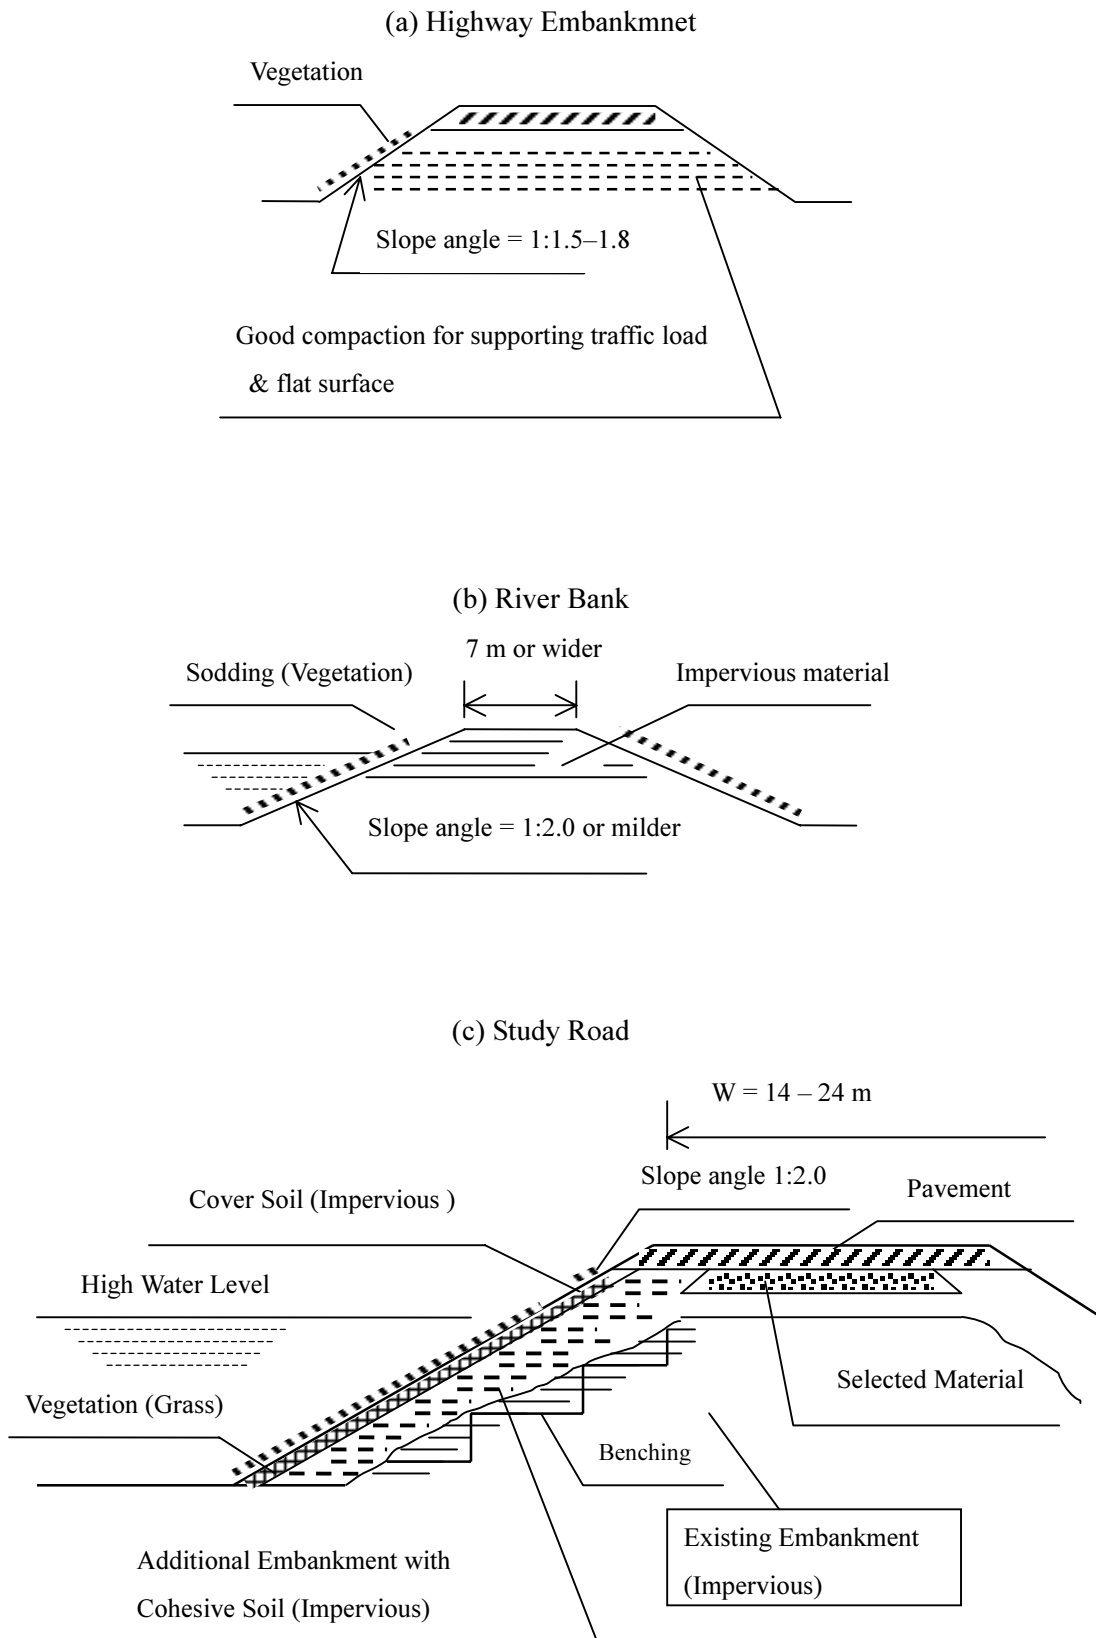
Structure of Highway Embankment, River Bank and Study Road
